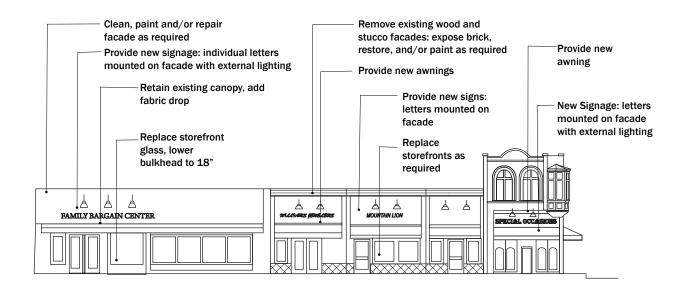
Downtown Retail North: Façade Renovation Guidelines
